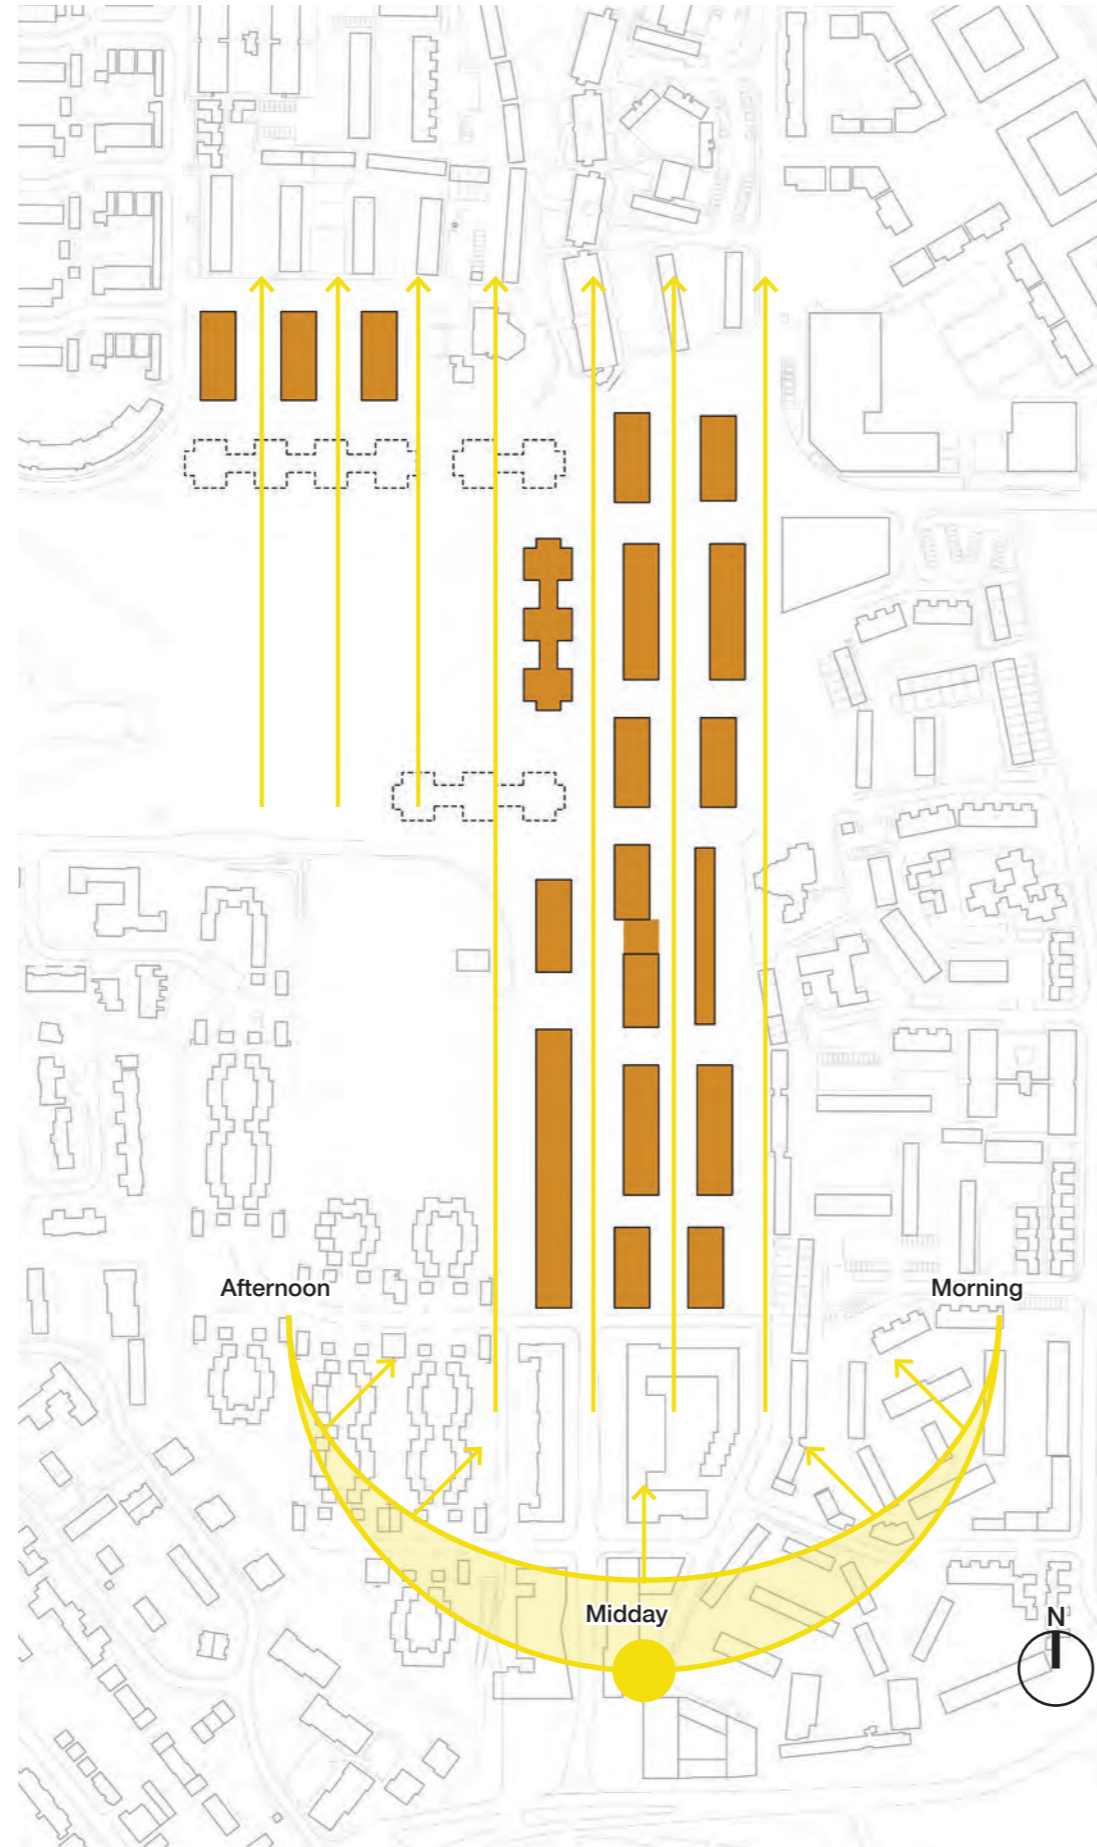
Majority of buildings aligned north:south to face east or west, opening up views and letting in sunlight
